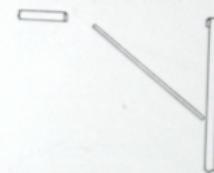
Floor plan showing position of door half closed, equipped with "SlydaSyde" CC hardware.
